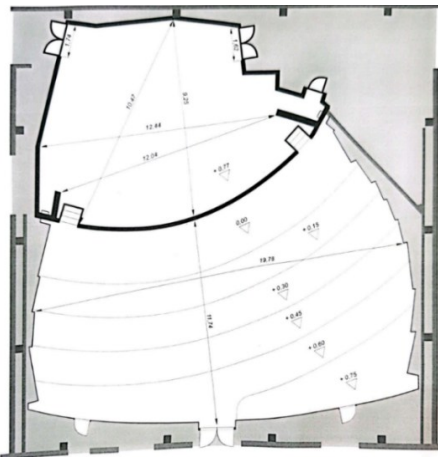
Plan layout of Vatroslav Lisinski small Hall.
